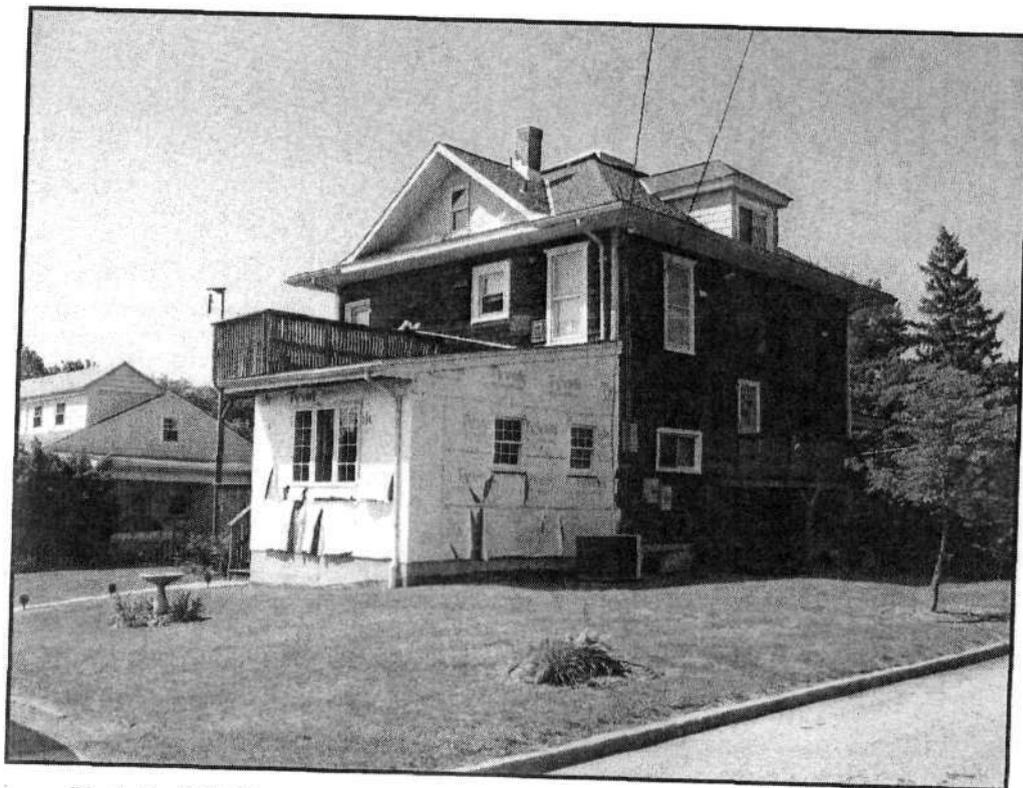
1727 Magnolia Avenue, East and North Elevations, View Southwest
